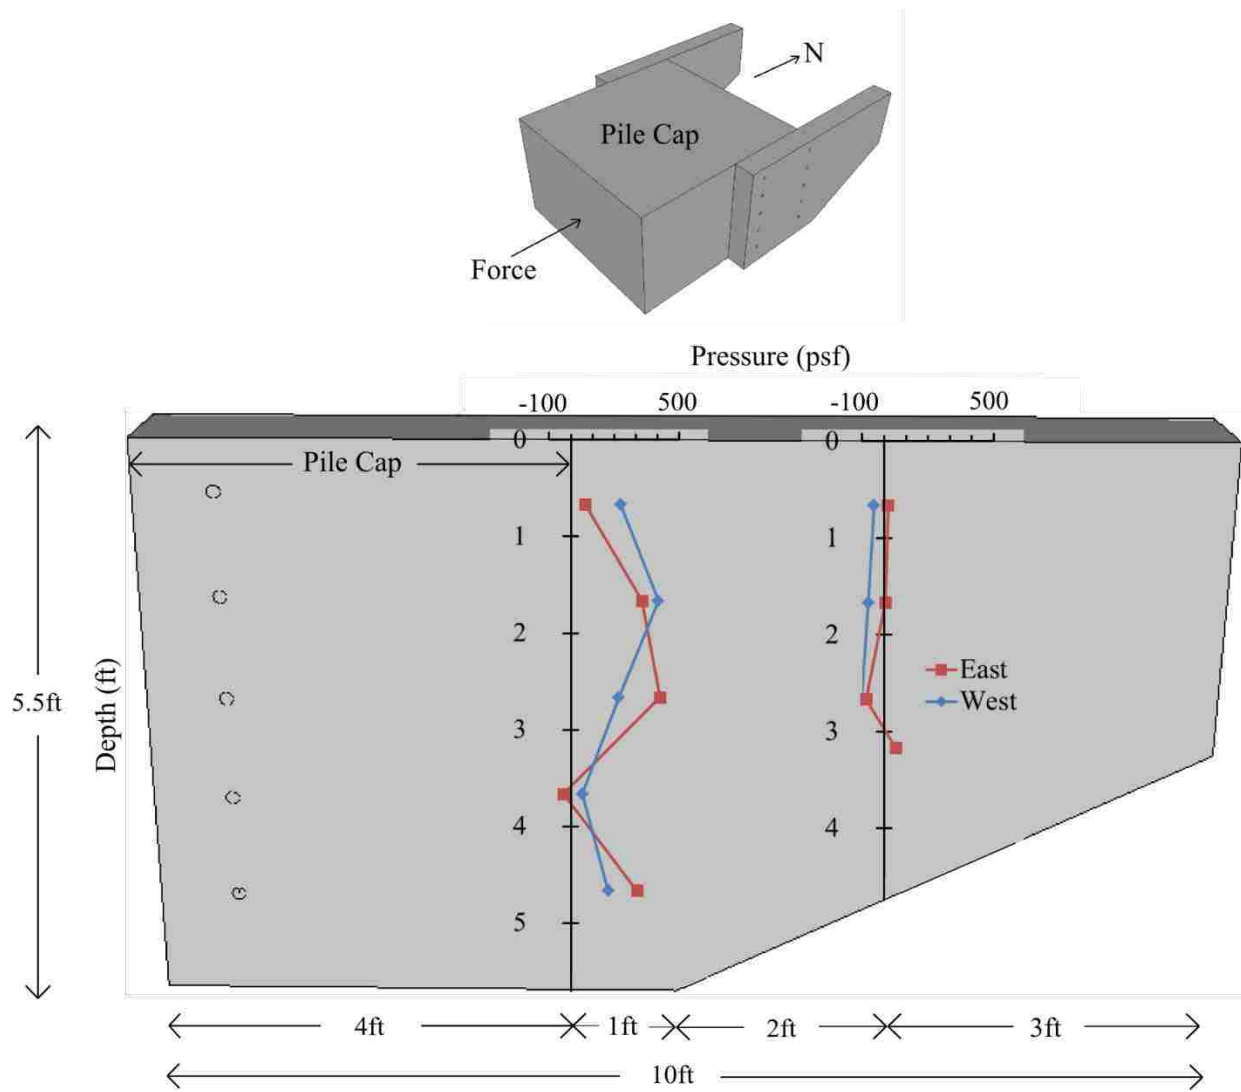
Horizontal pressure distribution along wingwall height at test completion for non-skewed abutment.
